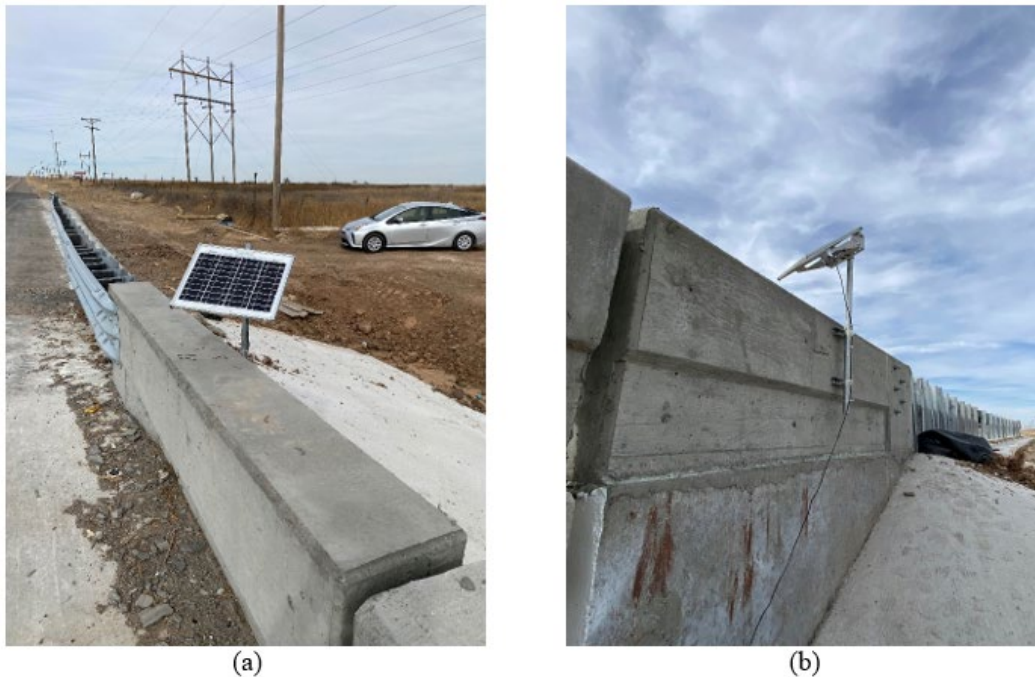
Farwell Creek Bridge Solar Panel Relocation. (a) View from bridge; (b) Relocation to wingwall – view from below deck
